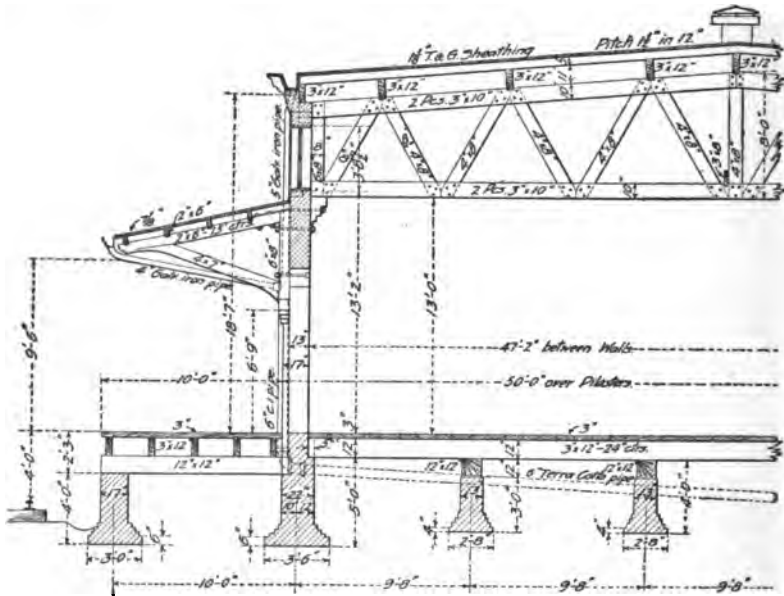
Cross-section of Freight Warehouse of Central of Georgia Railway at Atlanta, Ga.
